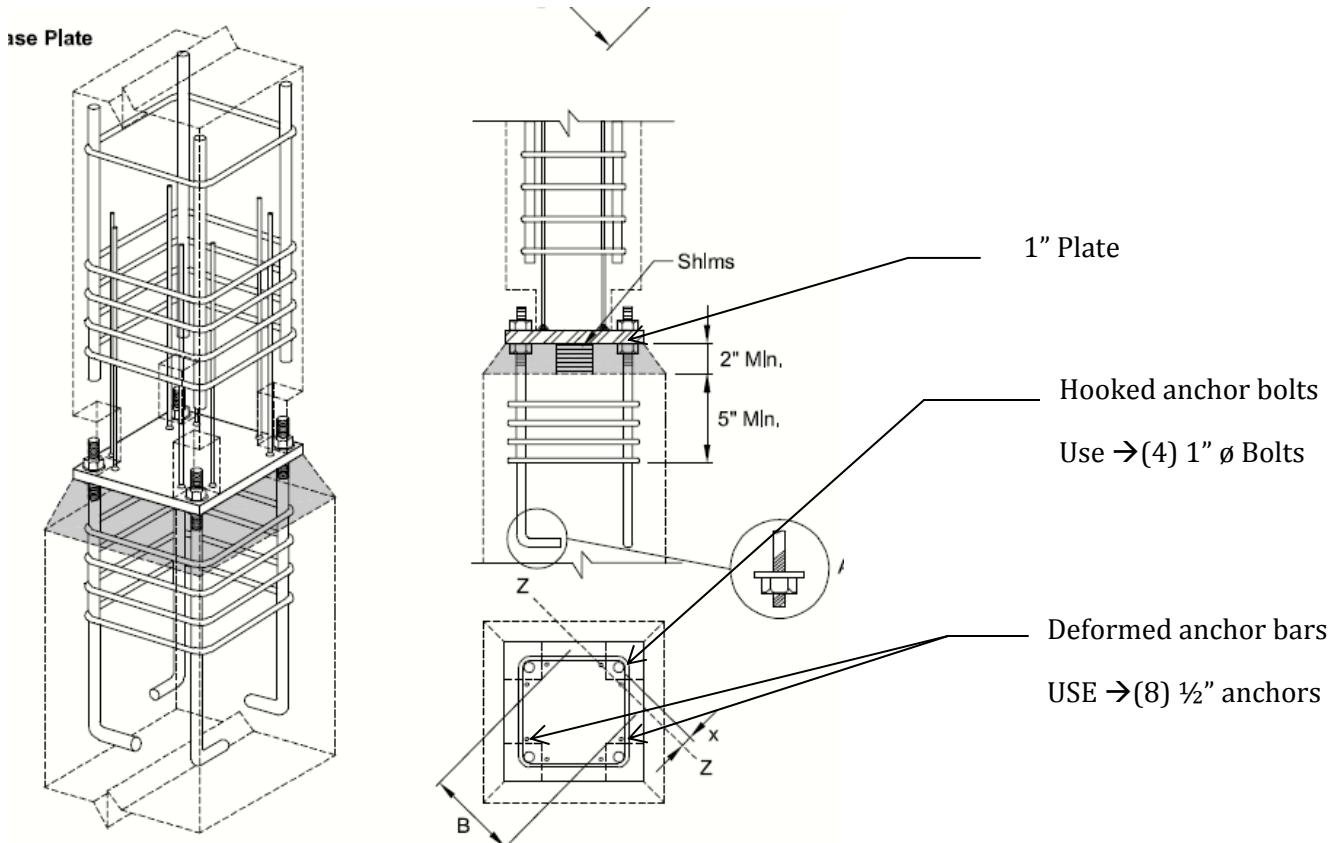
Typical detail as per PCI 6<sup>th</sup> edition
